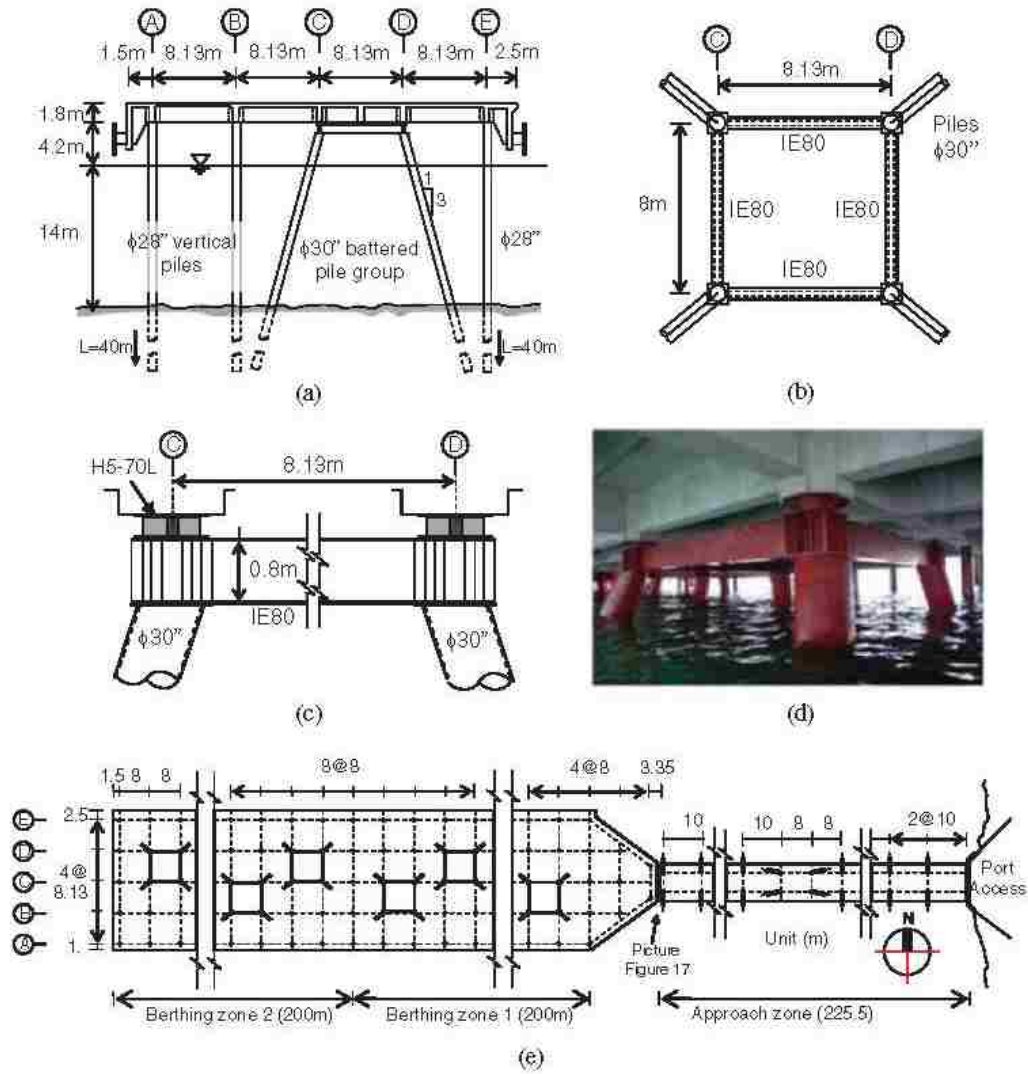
(a) Typical cross section of South Pier, Coronel. (b) Plan view of four battered-pile group. (c) LRB location on battered pile group. (d) Typical battered pile group. (e) Plan view of South Pier, Coronel.
